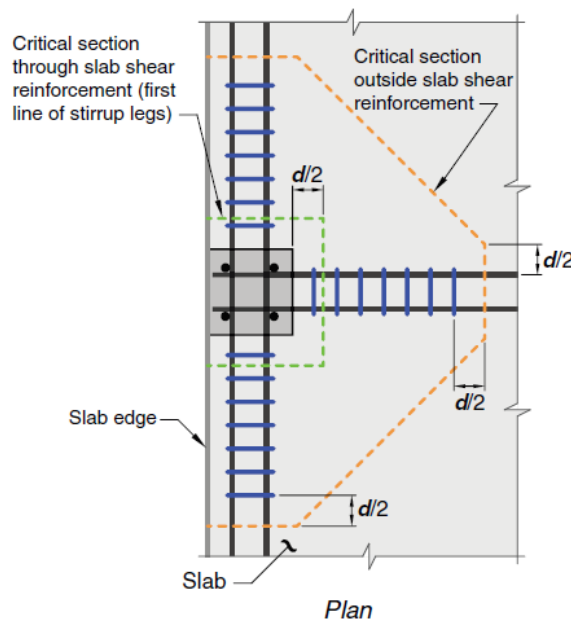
Critical sections for two-way shear in slab with shear reinforcement at edge column (ACI Committee 318, 2019)
